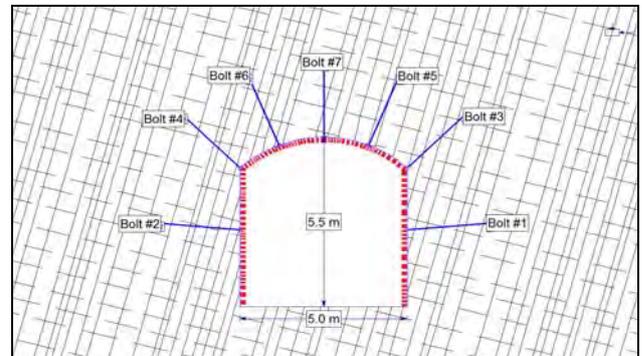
5 x 5.5m arched tunnel in jointed rockmass, supported by rockbolts (Split-Sets) and liner (shotcrete).
